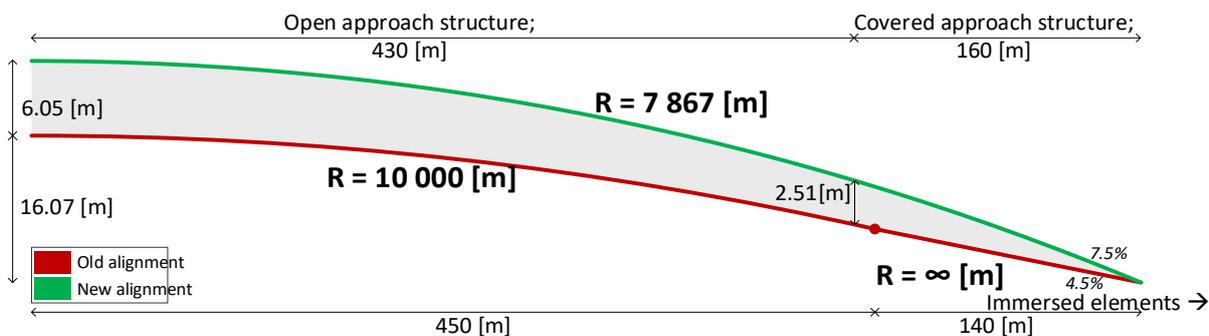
, APPROACH STRUCTURE OVERVIEW
